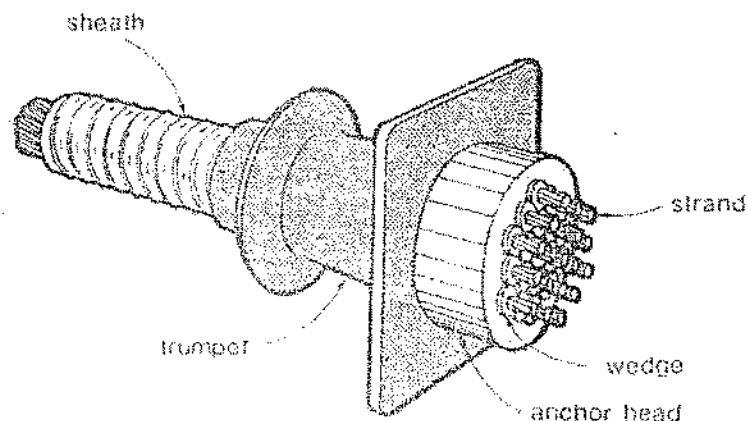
Anchoring devices (Reference: Collins, M. P. and Mitchell, D., *Prestressed Concrete Structures*).
